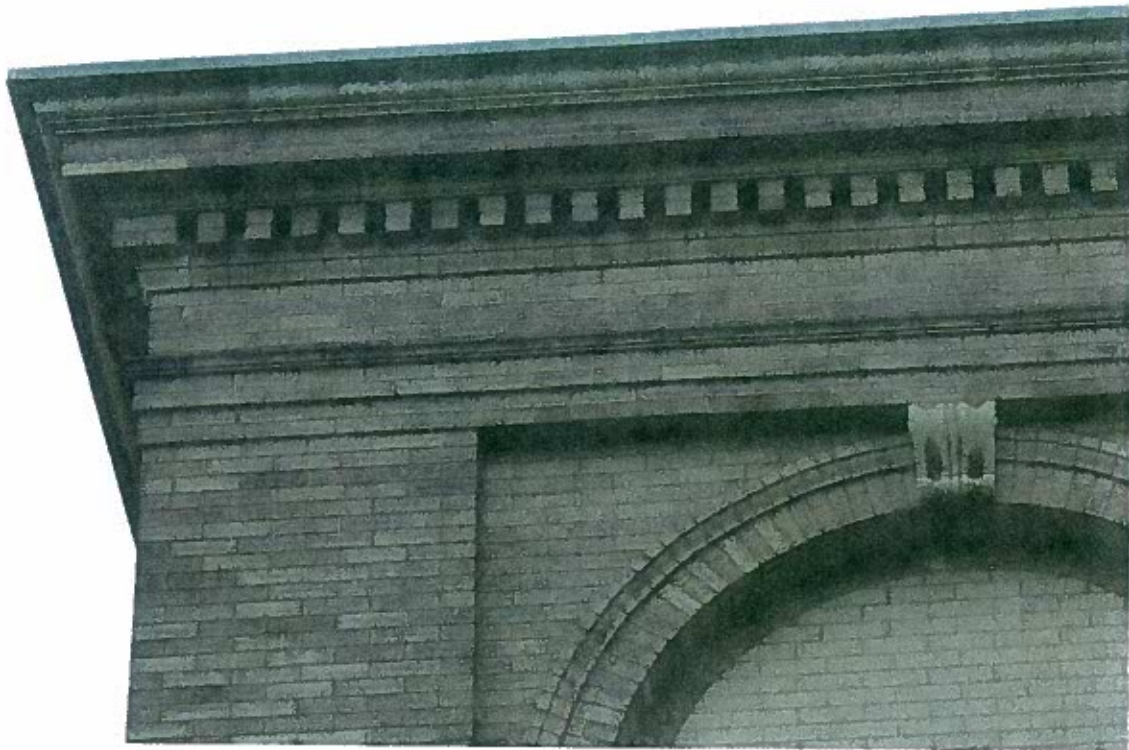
Brick details and dentils at top of wall, with limestone detail at top of window arch.
